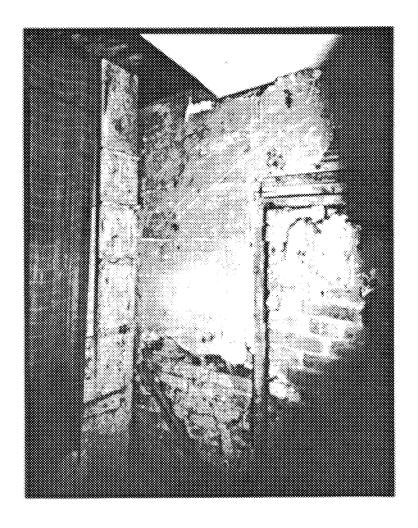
Grasslands Quarter, first floor: view of south corner showing details of shelving supports and brick nogging, looking south.
